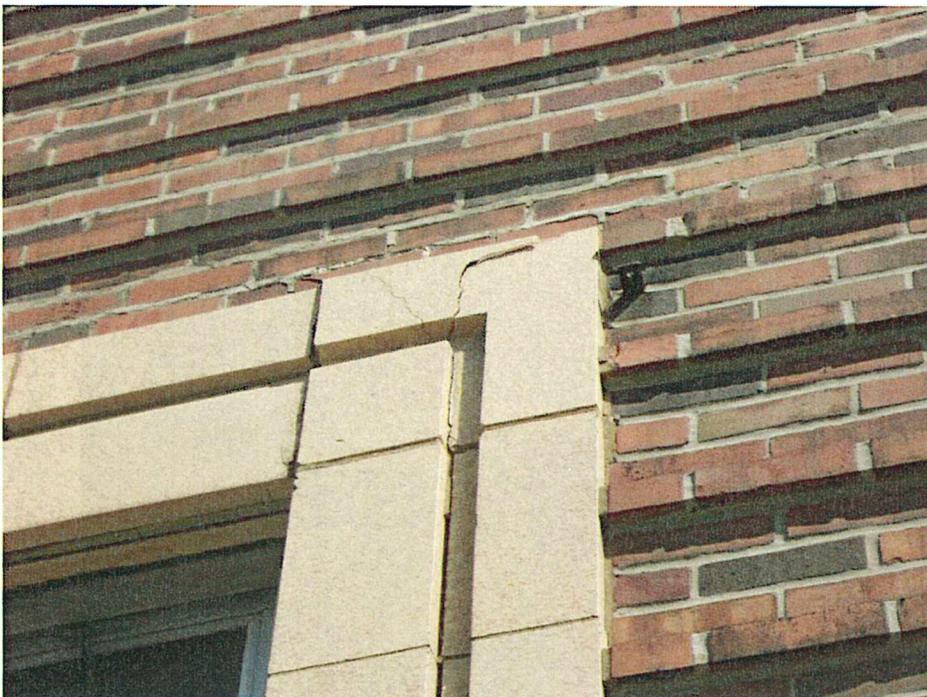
Detail of terra cotta surround at storefront. Note cracks in upper block.
